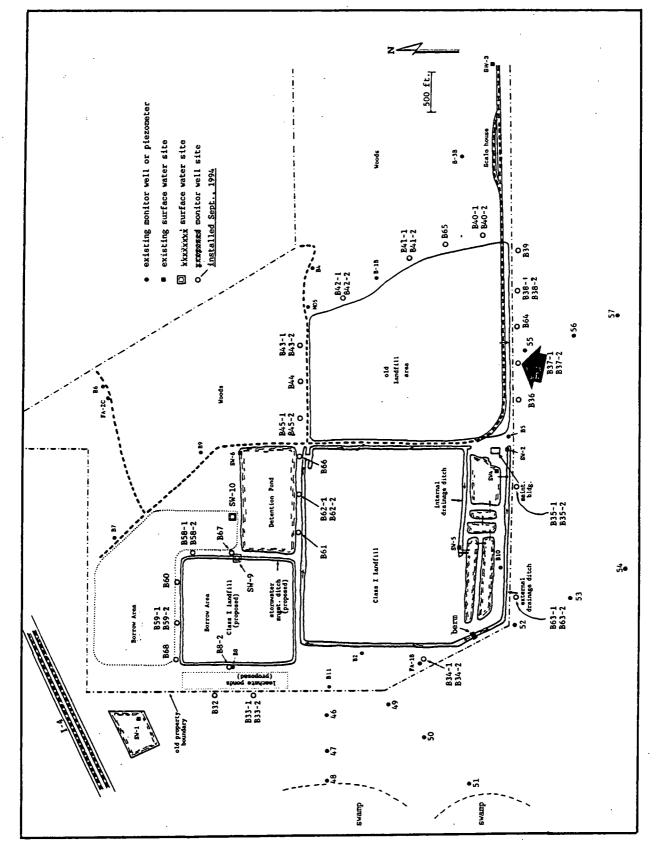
Landfill Site Plan & Location of Monitoring Site B37
